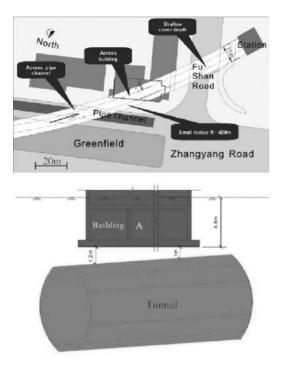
The plan view and transverse section of the double-o-tube shield tunnel crossing building A.
